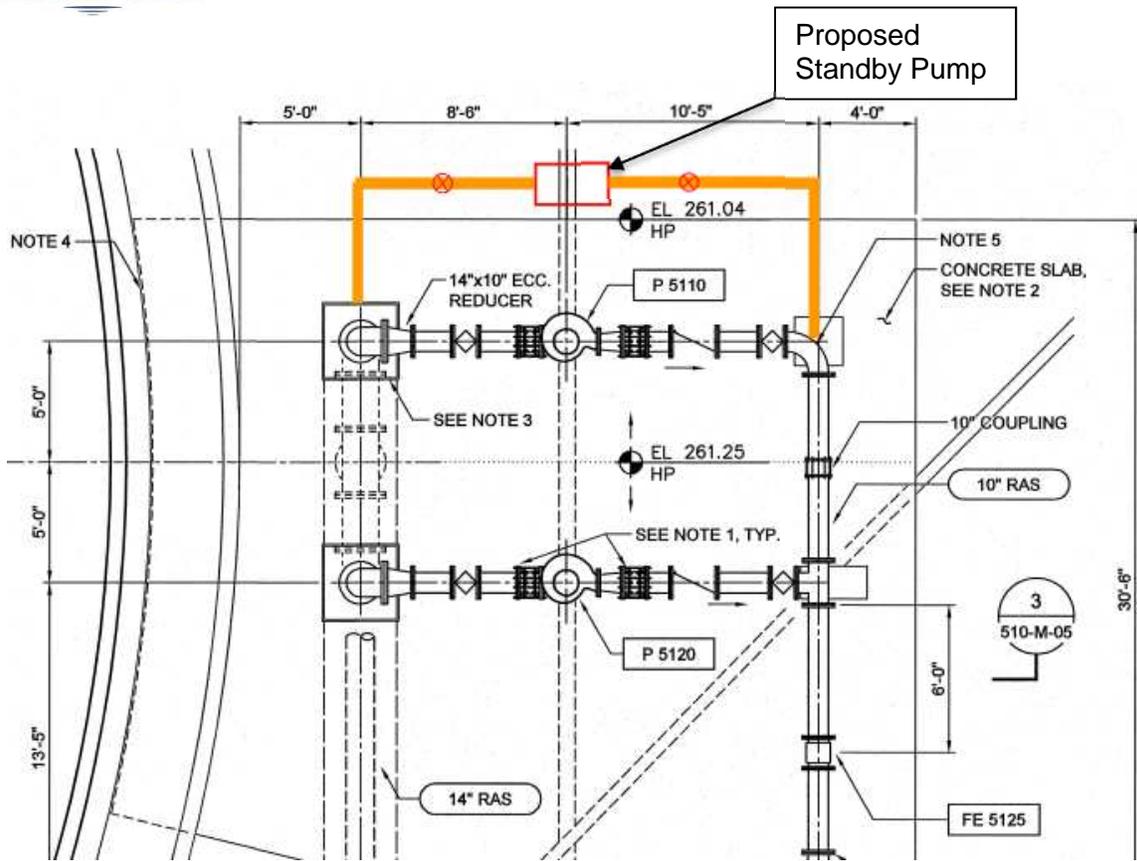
Proposed Standby RAS Pump and Piping for Clarifier 1
